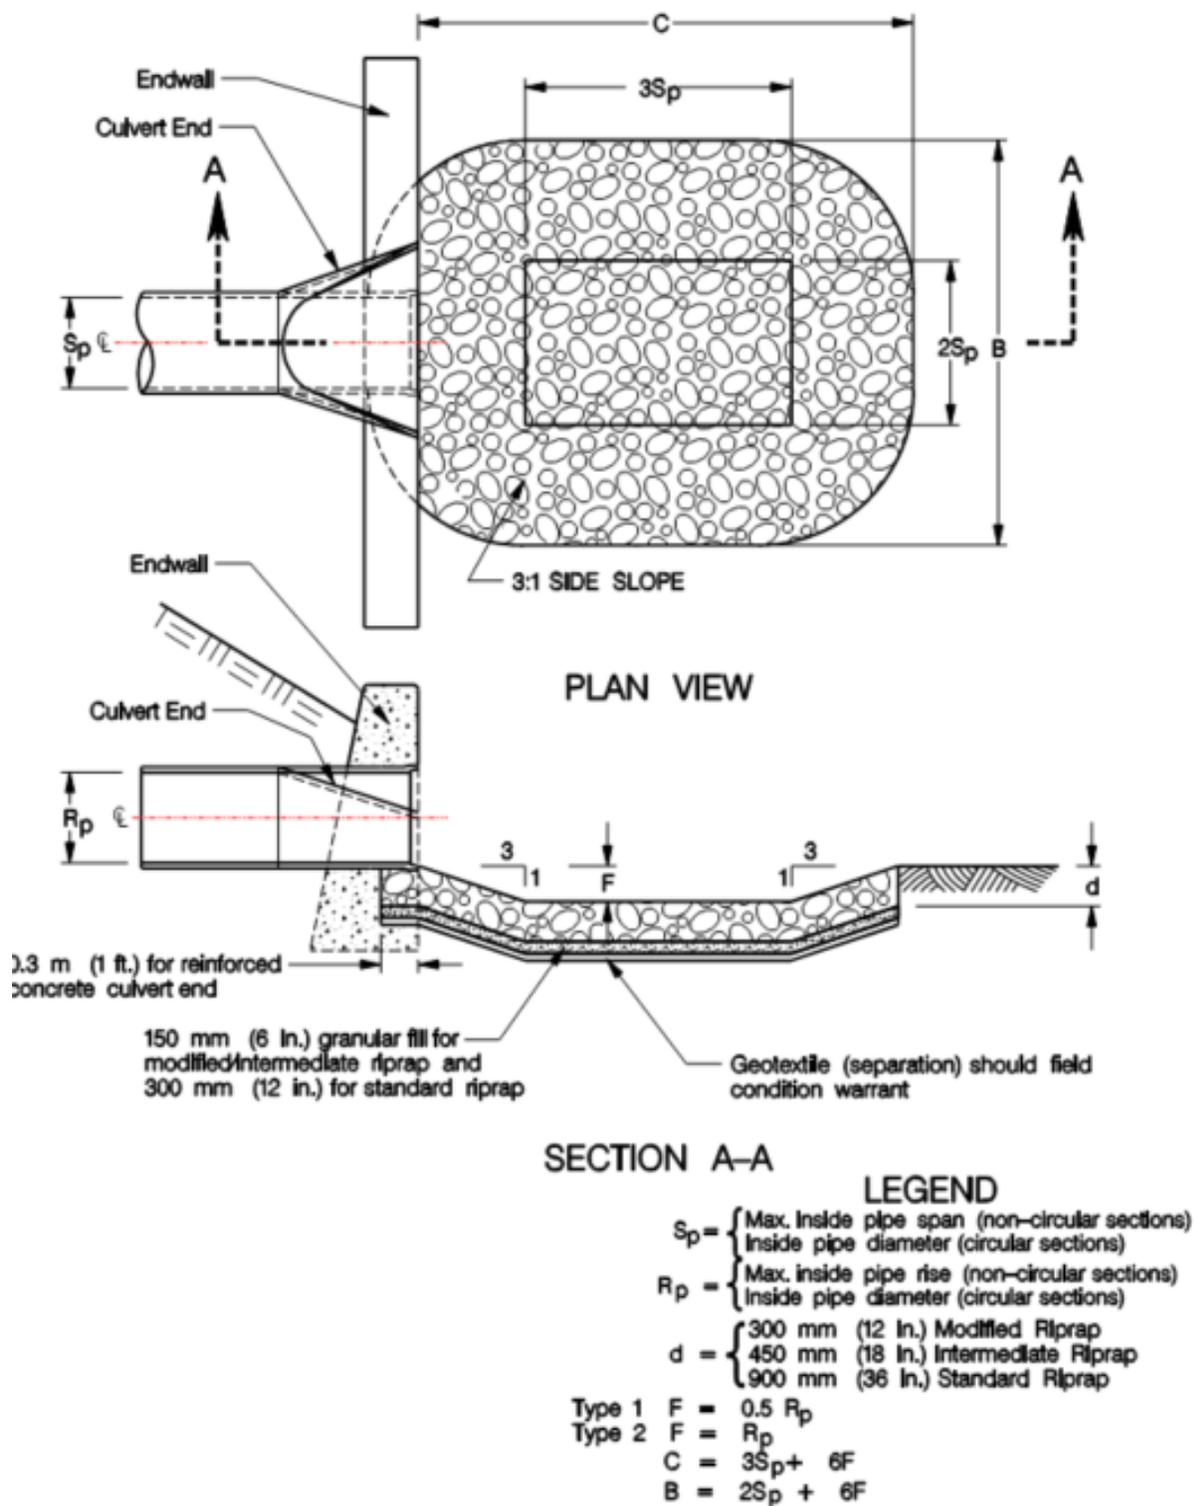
Preformed Scour Hole Type 1 and Type 2
